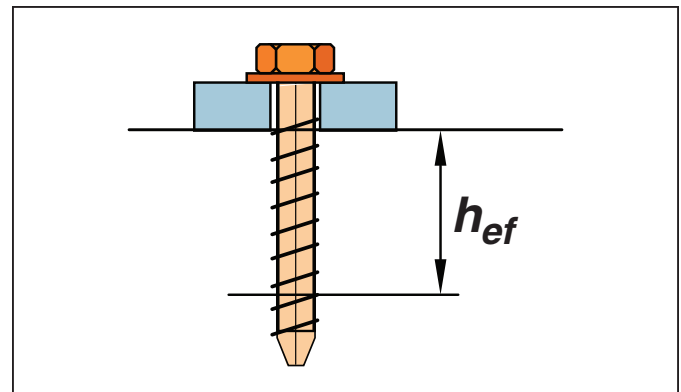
Screw anchor. Note: h_{ef} = effective embedment depth of anchor. Source: Adapted from ACI 318-19, Fig. R2.1.
